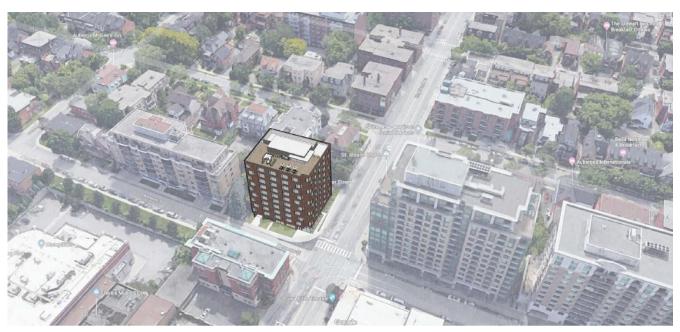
Bird's Eye View of the intersection of Besserer and King Edward looking south. The set back of the Besserer Street elevation provides relief for the smaller residential home at 256 Besserer. Hobin 2019
